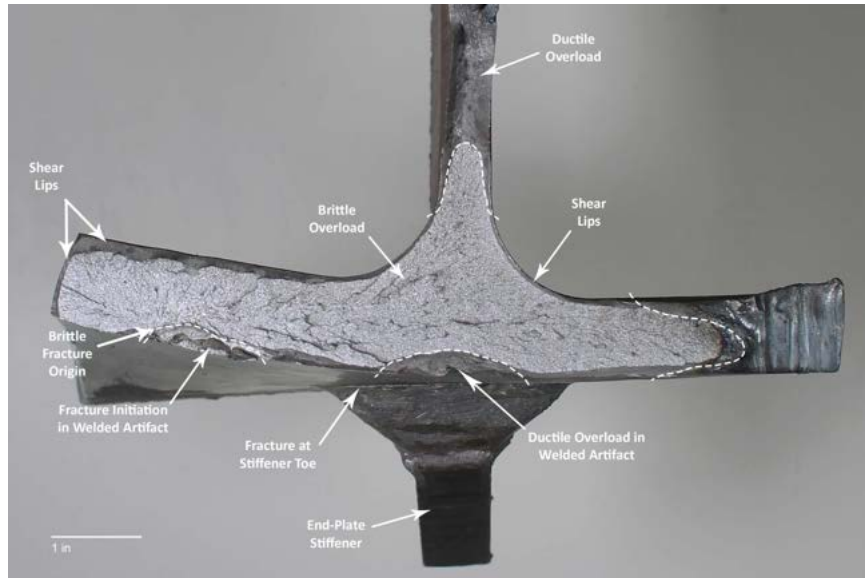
Bottom flange fracture closest to the end-plate, looking towards the end-plate.
